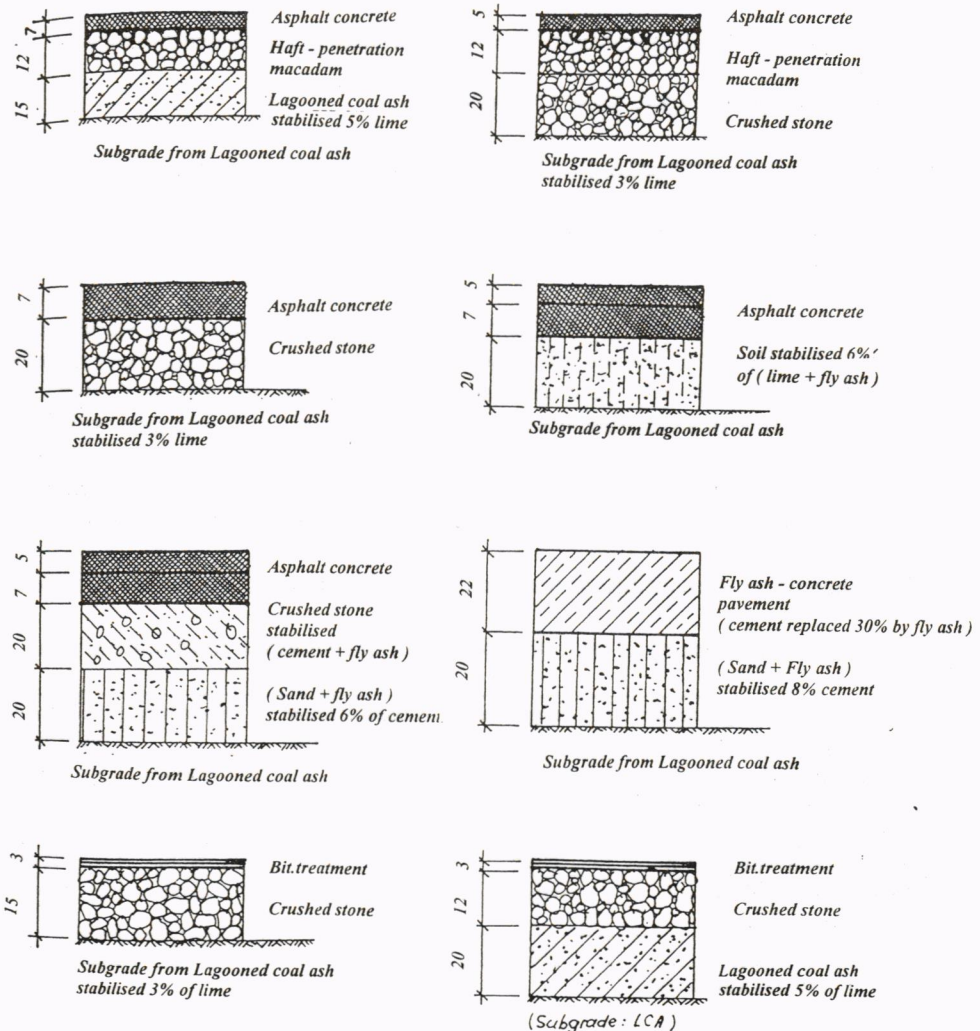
Typical pavement structures using coal ash proposed in Vietnam
